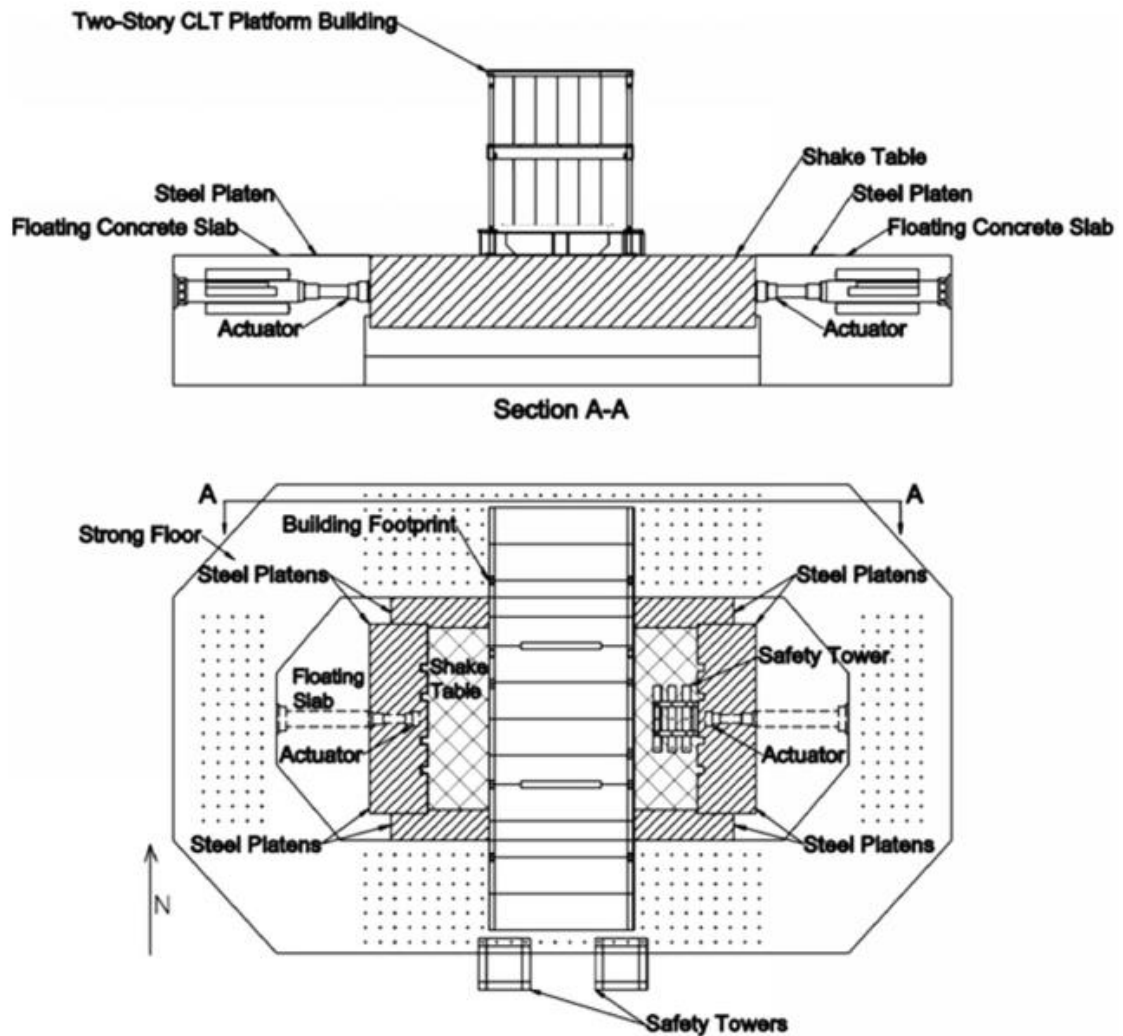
Position of the two-story CLT Platform Building on the shake table.
